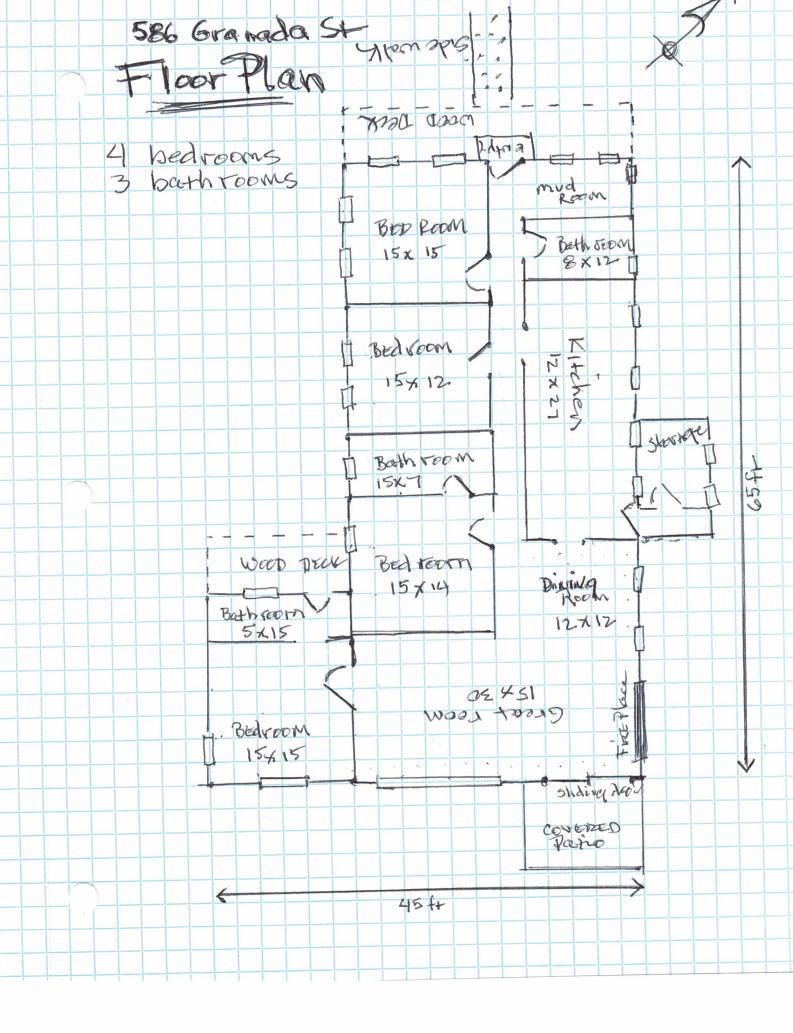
Granada Site Plan for Special Use Permit for Short Term Rental Application
